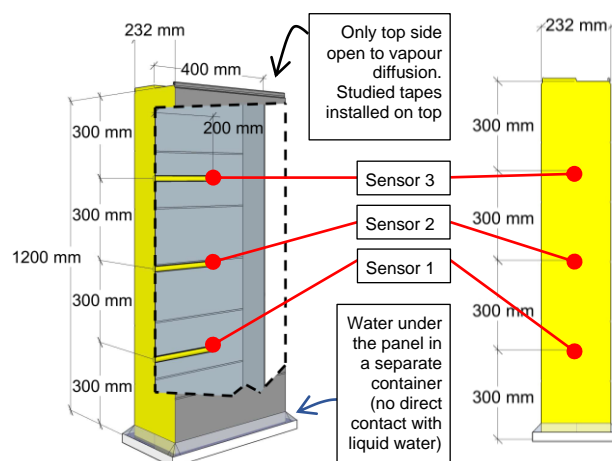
A 3D and a 2D section cut of a test wall with sensor locations indicated.
